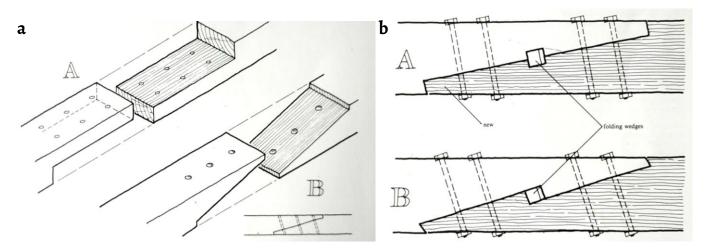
Typical scarf joints: *a*) two simple scarf joints for repairing horizontal elements, sill plates or wall plates, the size of joints should be 2.5 to 3 times the depth of the plate; *b*) the most common scarf used in tie beams, this type of joint is strong against curving upwards or downwards in the middle and sideways movements [19].
